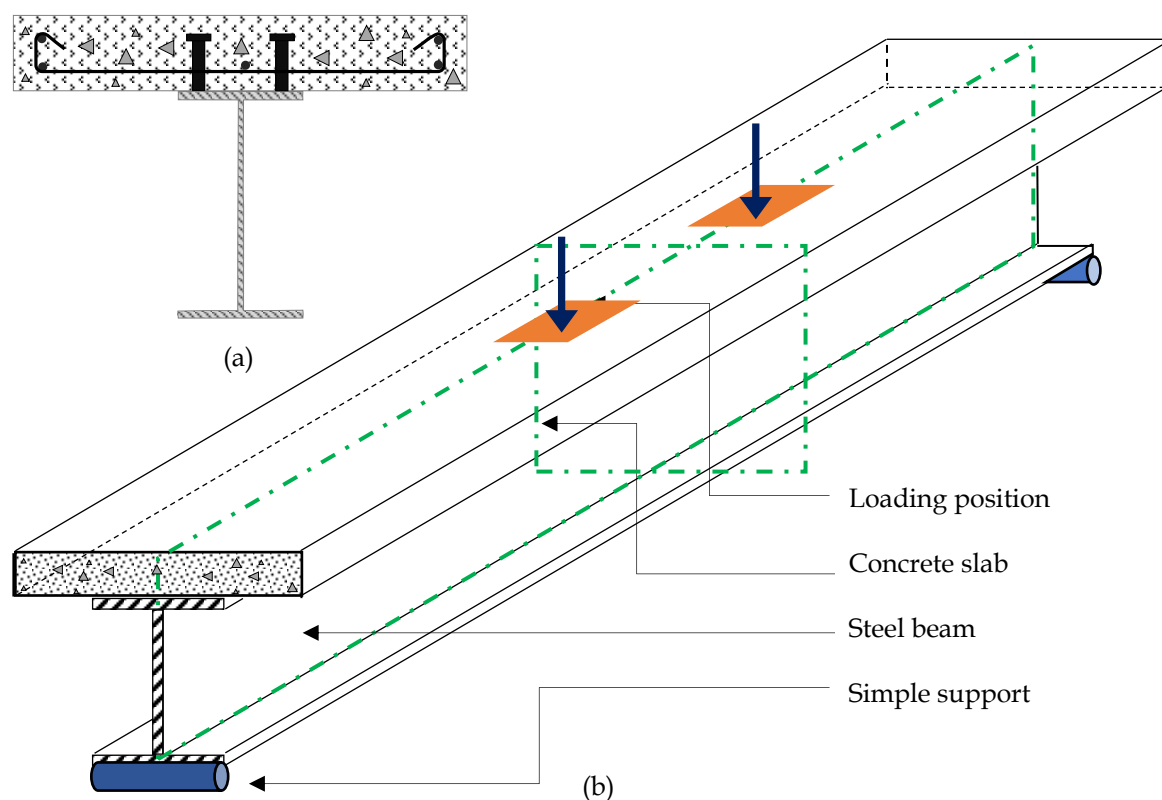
Mechanical headed stud connected steel-concrete composite simply supported beam; (a) cross-sectional view and (b) isometric view
